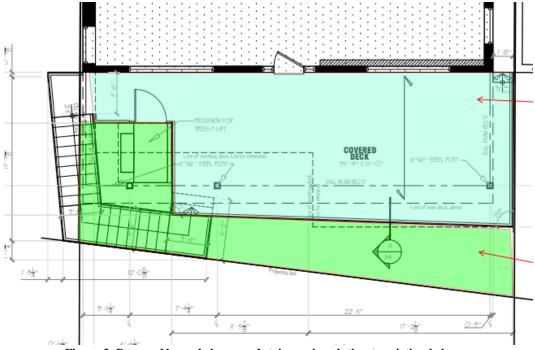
Proposed lower balcony and staircase in relation to existing balcony.
